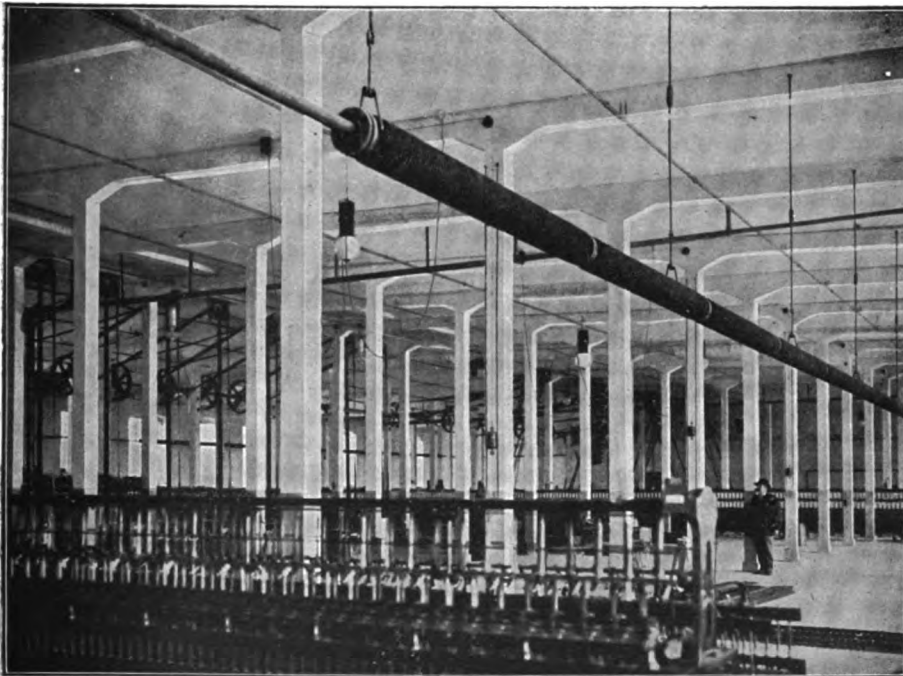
Reinforced Concrete Construction of Floors and Columns in the Speyer Cotton Mill on the Rhine.
